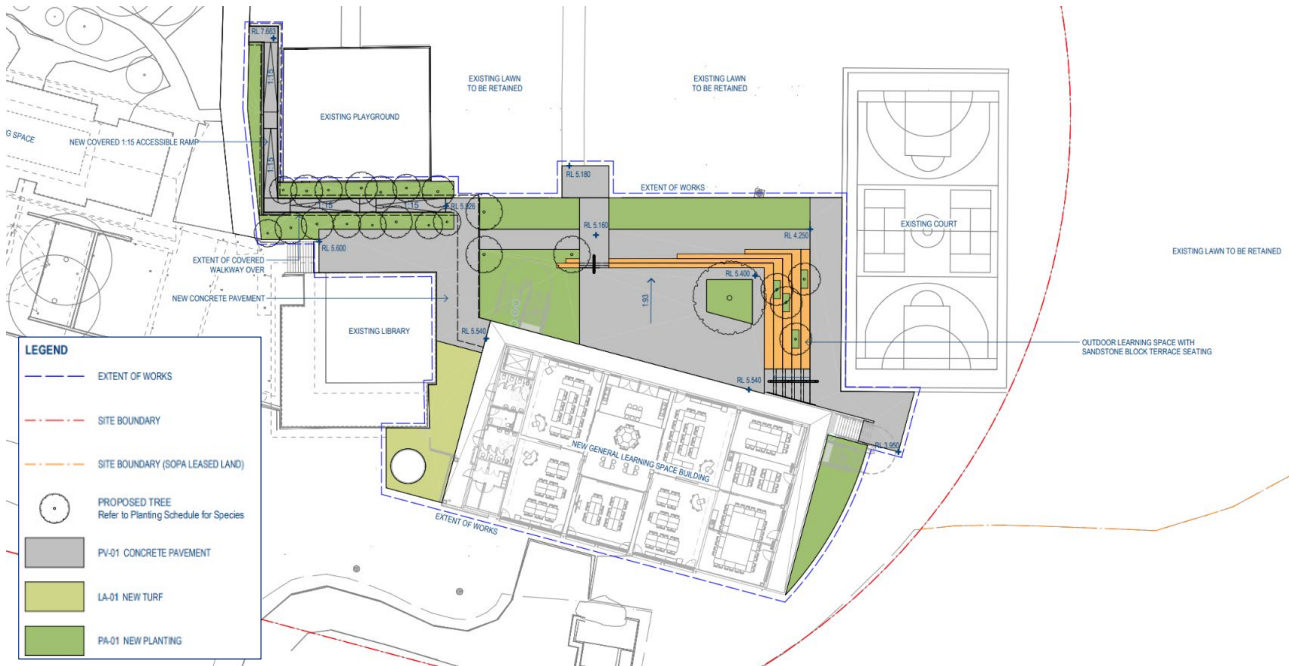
Indicative proposed landscape plan (Source: Architectus)
